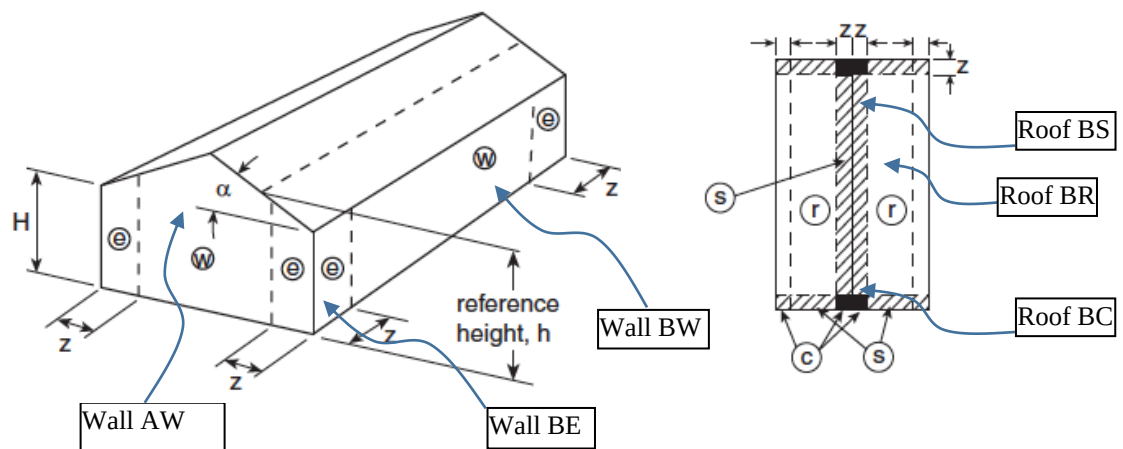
NBCC'15 zones for pressure coefficients on cladding and secondary structural members adapted for Model 2 Case 2 a) Walls zones (NBCC 2015 4.1.7.6-B), b) Roof zones (NBCC 2015 4.1.7.6 E)
